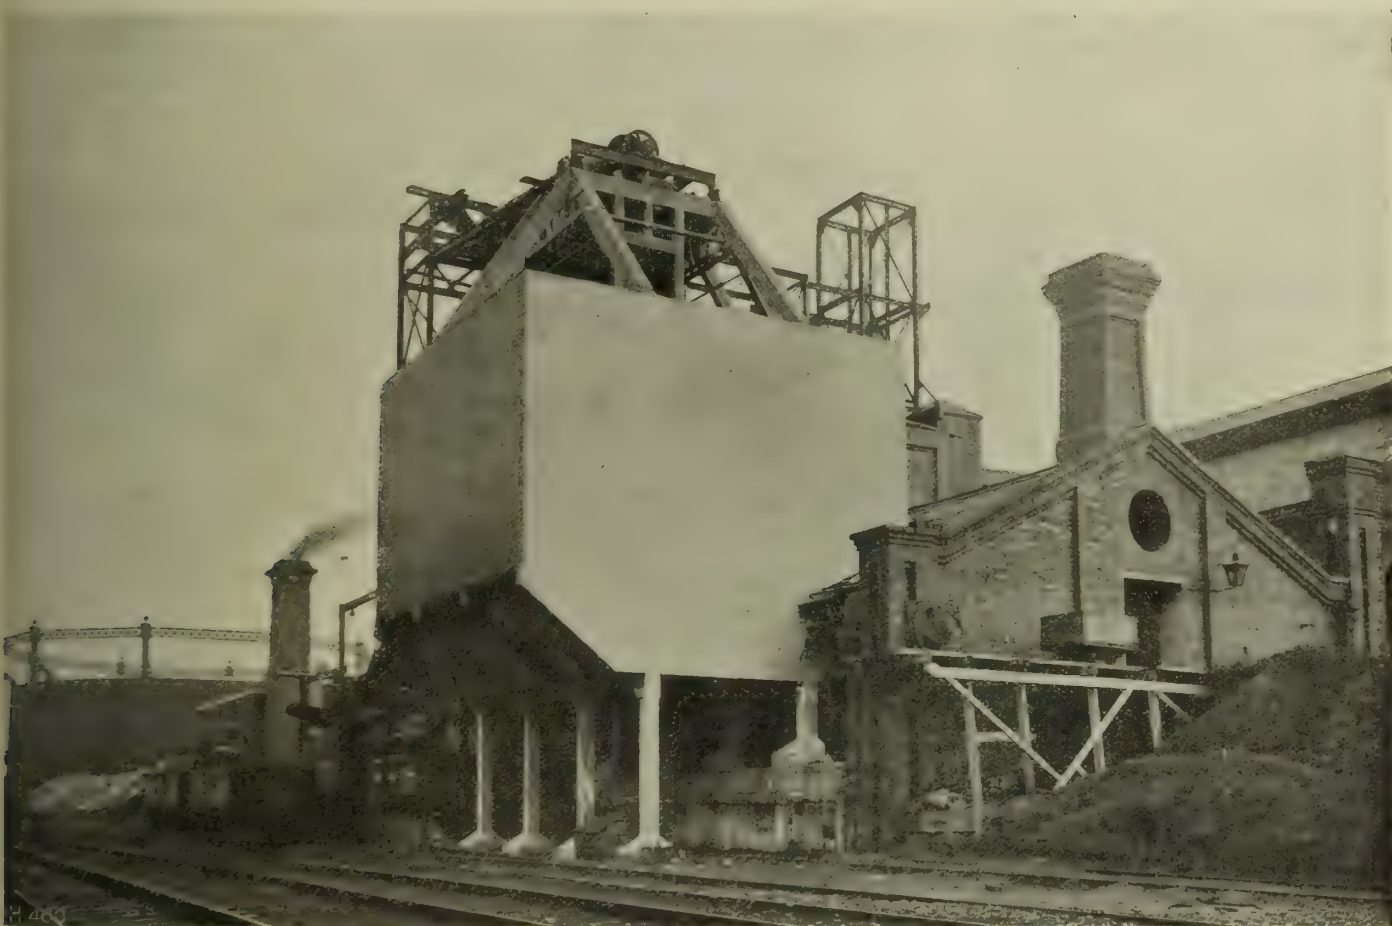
Reinforced Concrete Coke-Bunker at Dunfermline.
